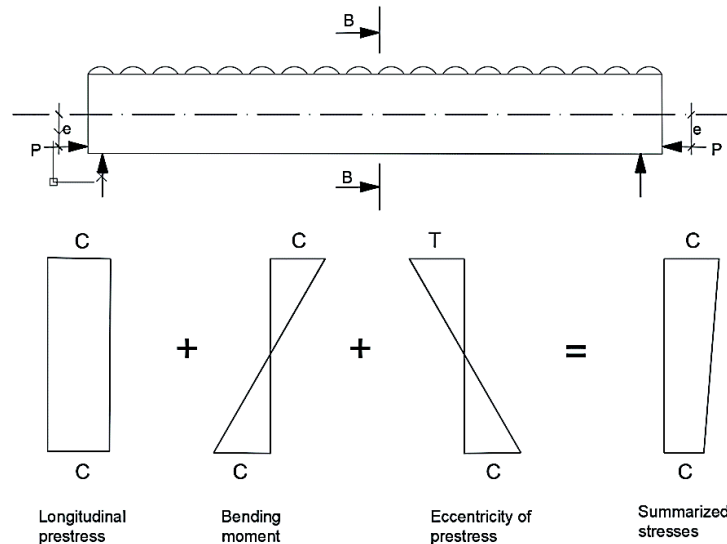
Principle of eccentric prestressing. The stresses are abbreviated as follows: C – compression, T – tension.
